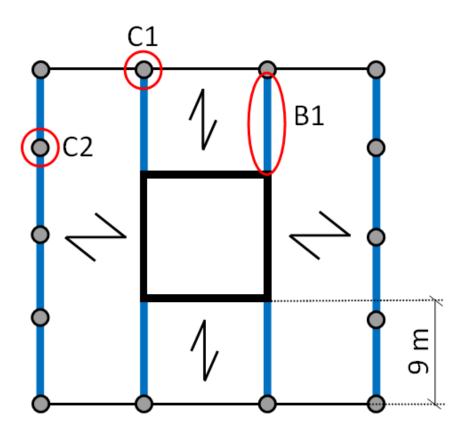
The measurements of the plan used for a high rise building with a Core as stability system.
